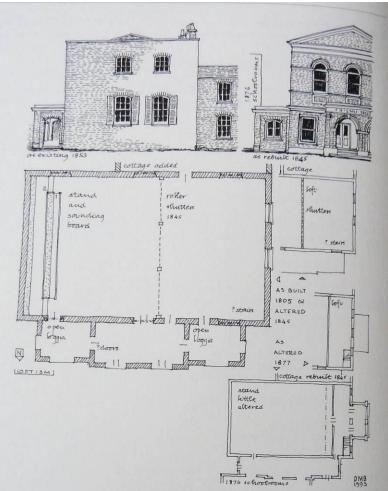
Plans and elevations of the Meeting House as originally and as later altered. (North is at the bottom of the plan; not to scale) (Butler (1999), vol. 2, p. 600)
